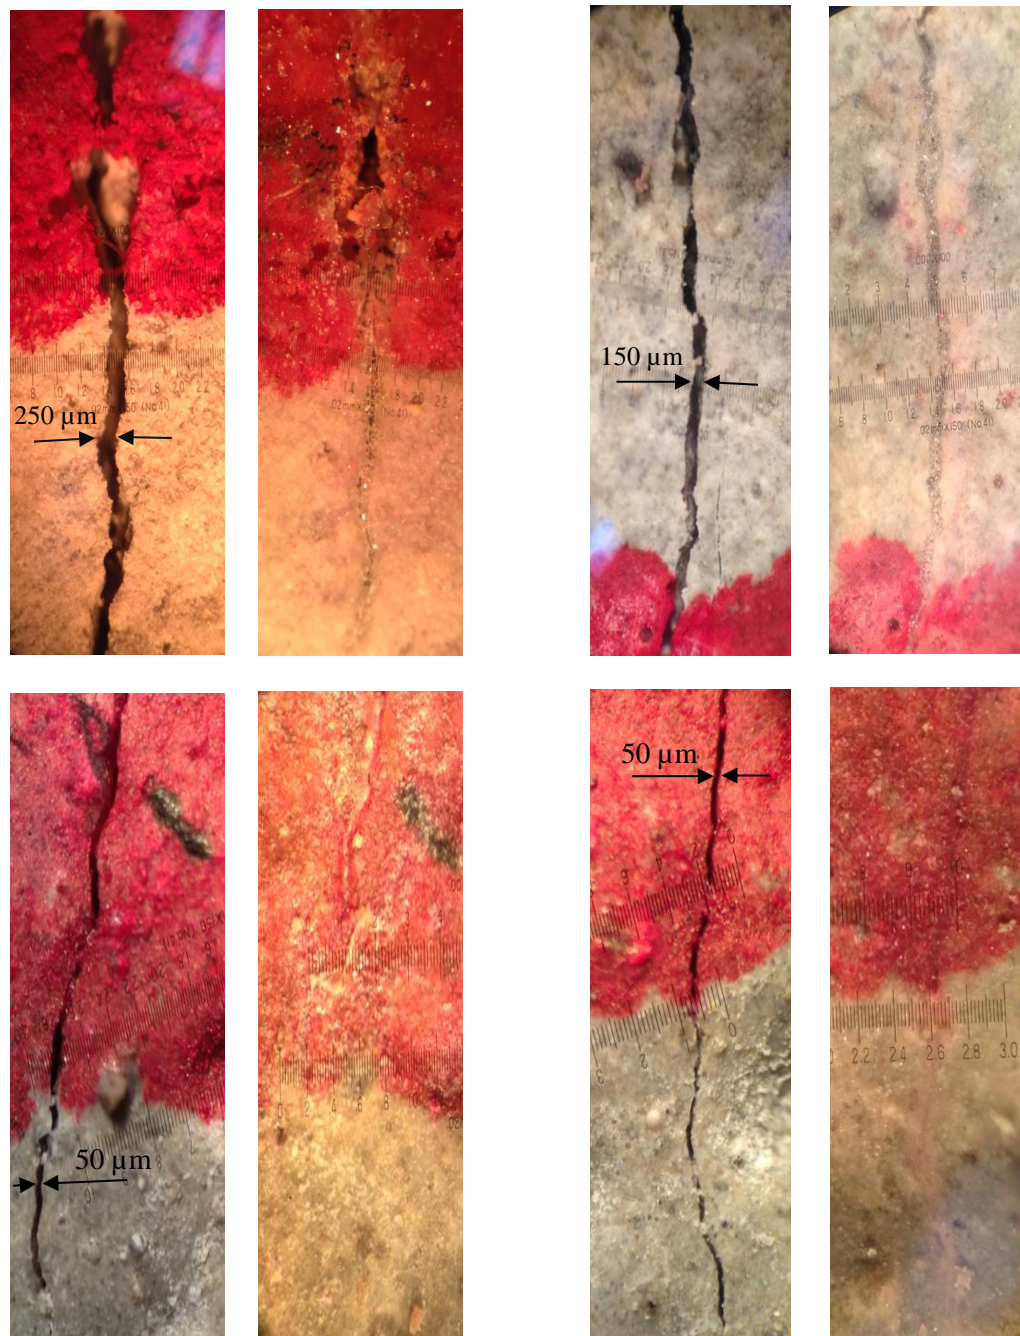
Surface cracks before and after water submersion showing self-healing.
